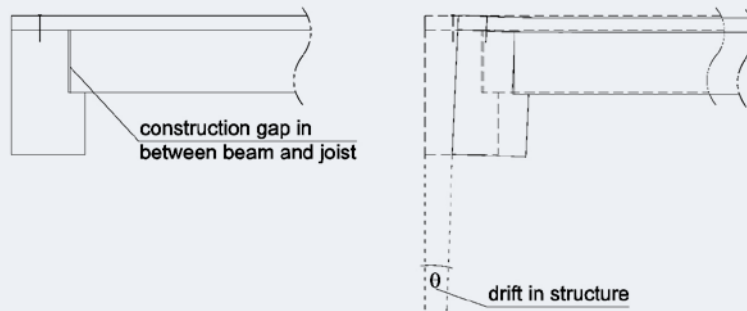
Construction gap between a timber floor and supporting beam to allow for rotation: a) undeformed state; b) deformed state.
